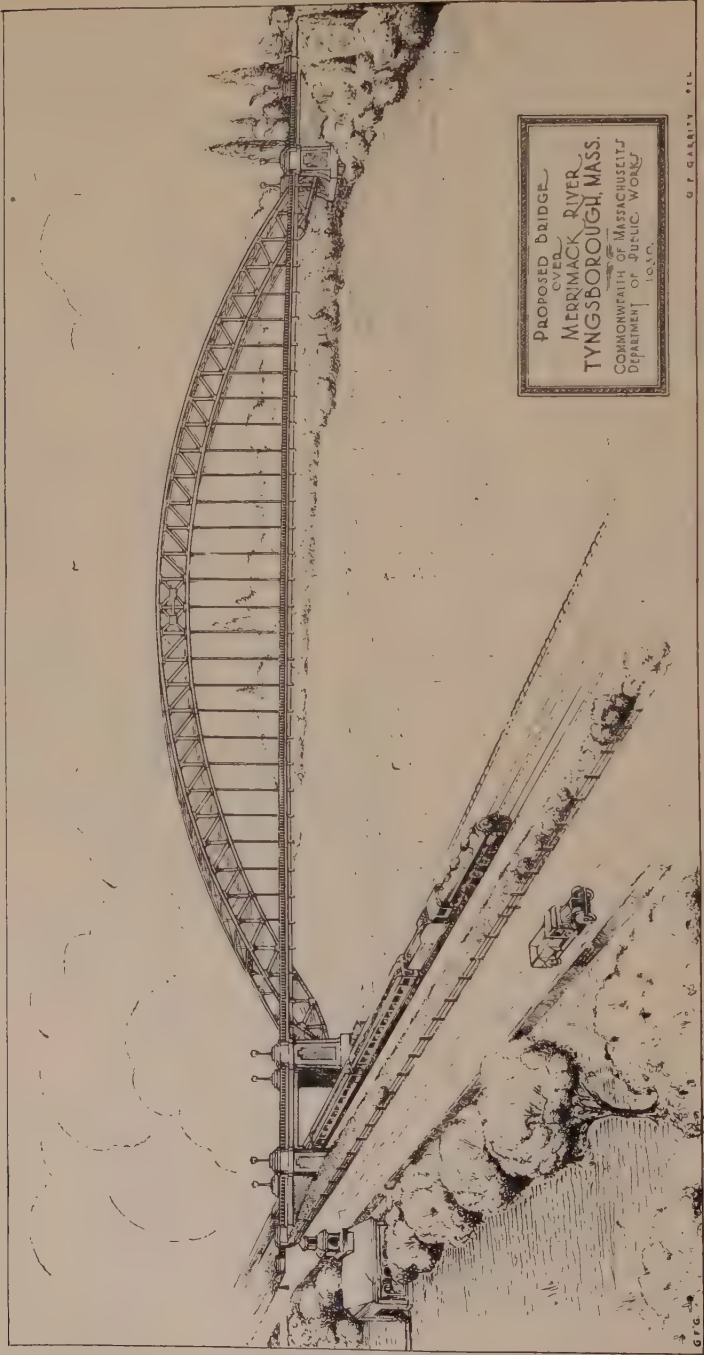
NEW TYNGSBOROUGH BRIDGE
